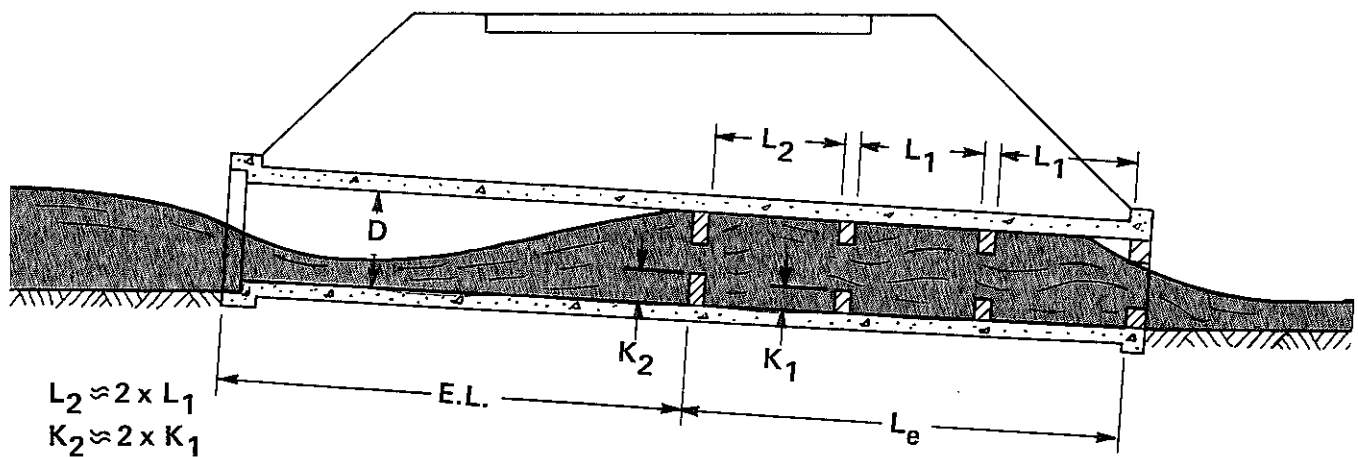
FULL FLOW IN PIPE CULVERT.
